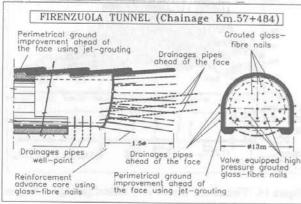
"Firenzuola Tunnel: longitudinal and cross section at Km 57+484.
